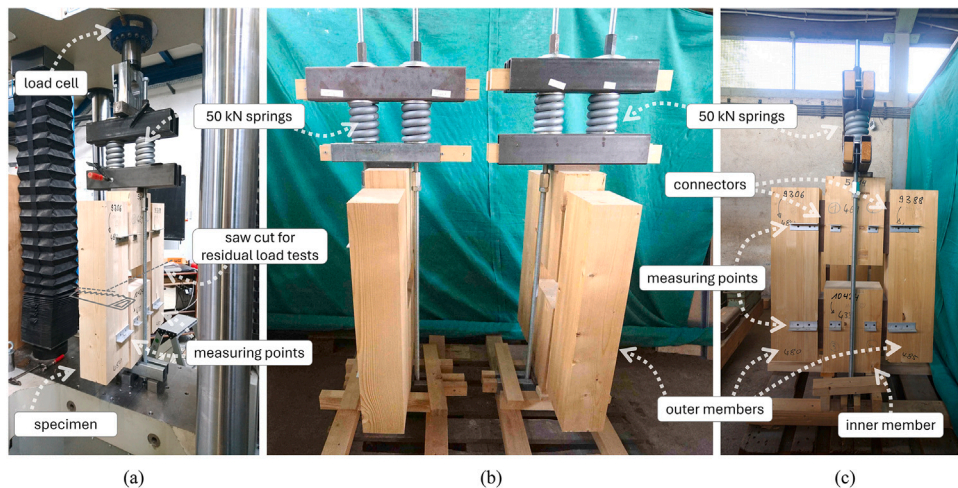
Loading of specimen (a) and test setup of long-term tests (b+c).
